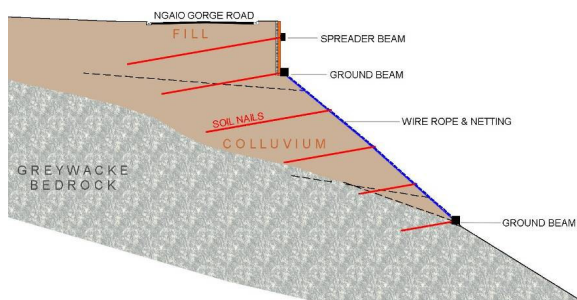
Soil nailing for strengthening Ngaio Gorge Road
